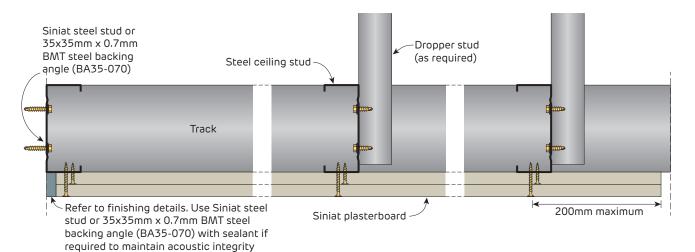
Stud Ceiling Type A2 - Fixed / Sliding Elevation
